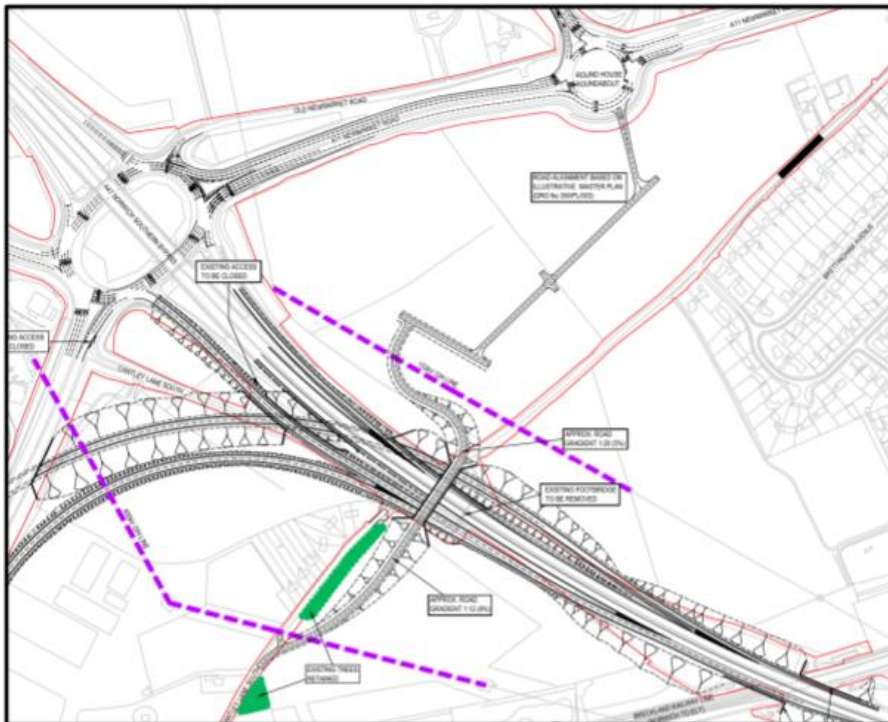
Option 1 - Connection of Cantley Lane South to Round House Way roundabout via an A47 overbridge
